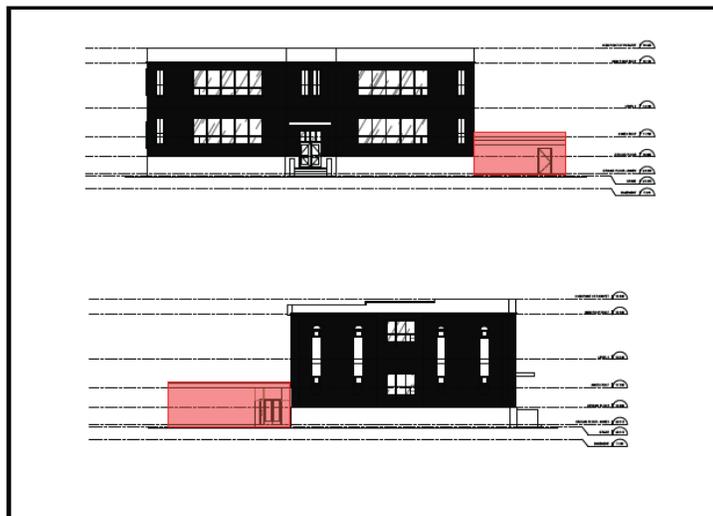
Southwest and northeast elevations of proposed demolition. EVOQ.
